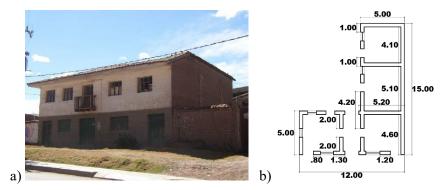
a) "L" shaped two-storey adobe house, b) plan distribution of 1st and 2nd stories.
